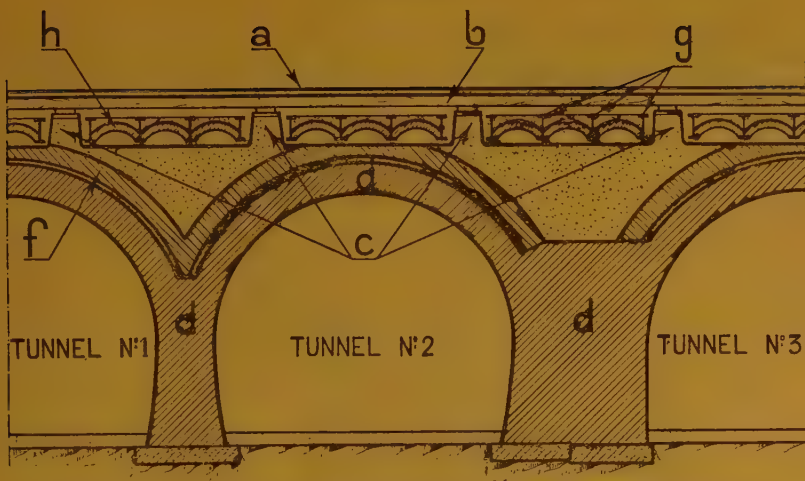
Construction of the lower flooring carrying Metropolitan line
